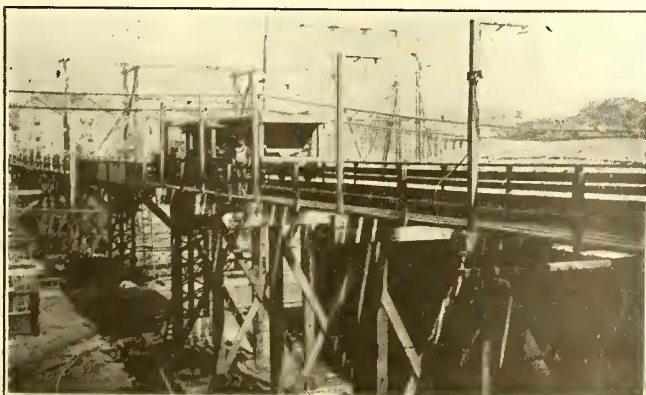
LATTICED COLUMNS OF THE BRIDGE AND TRESTLE TIMBERING
